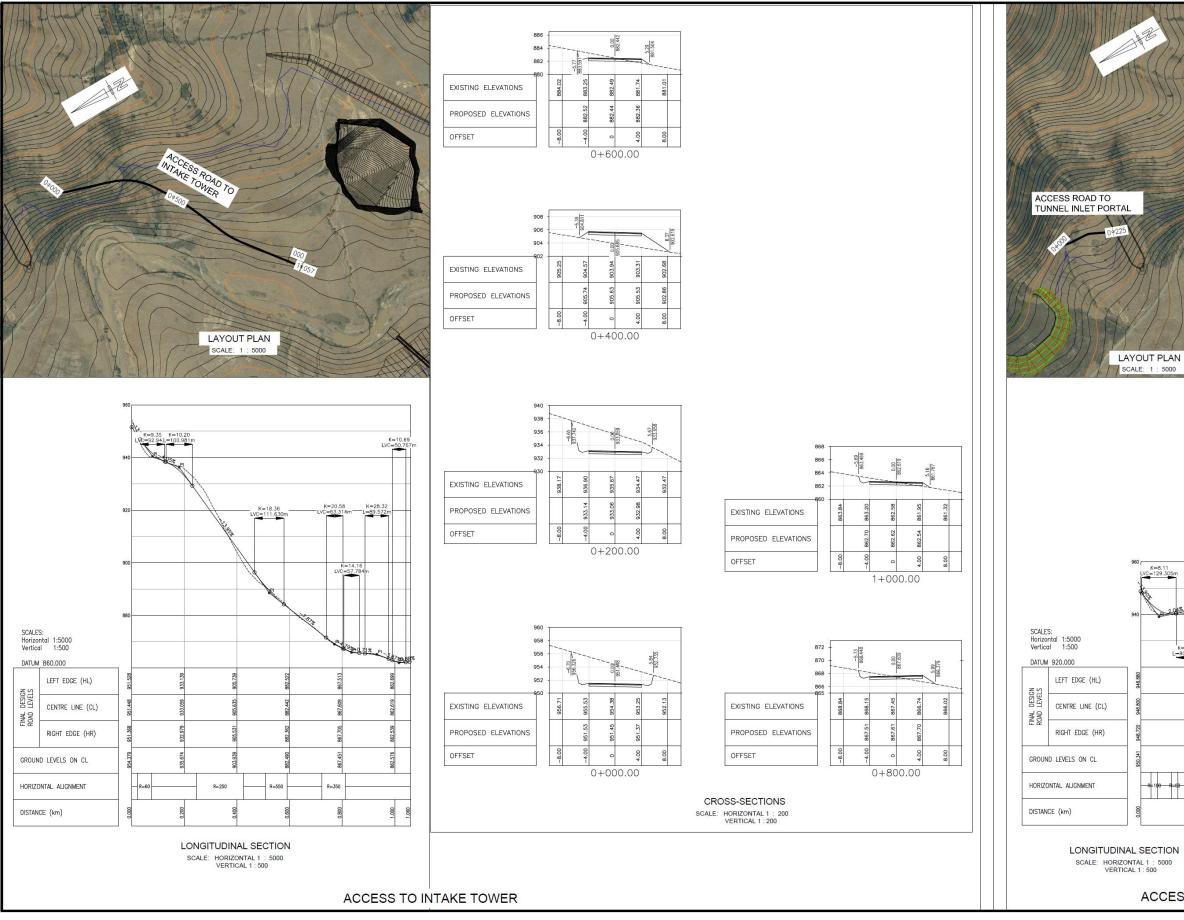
Smithfield Dam – Layout plan, longitudinal sections and cross sections of access road to intake tower and tunnel inlet portal
